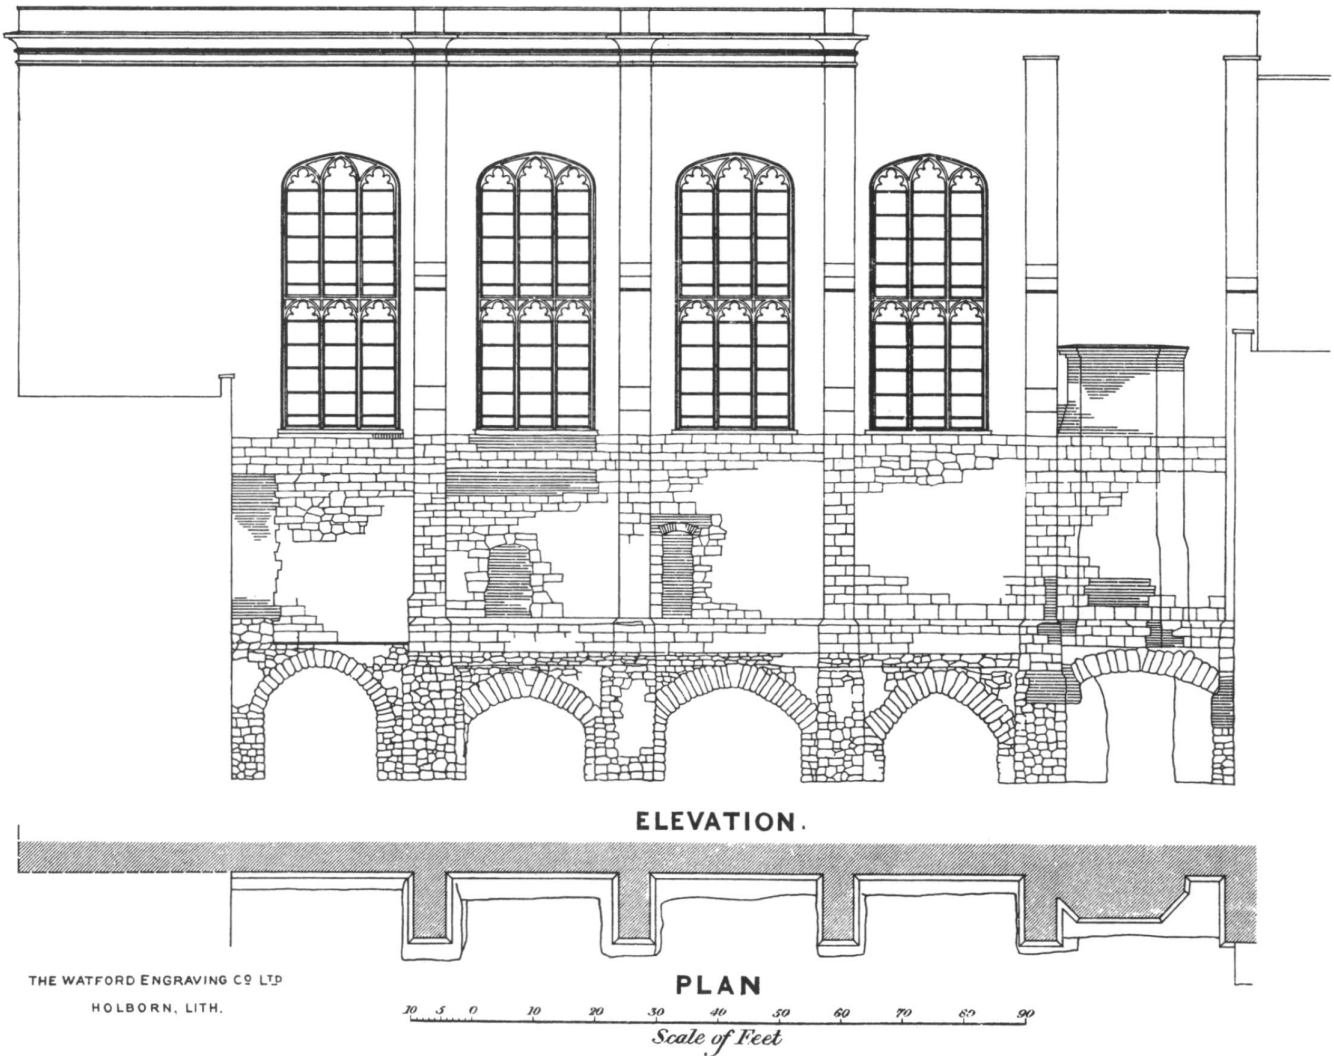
Foundation arch, late fourteenth century, under the south-east wall of the Great Hall. Discovered during the excavation of the Muniment Room in 1919.
